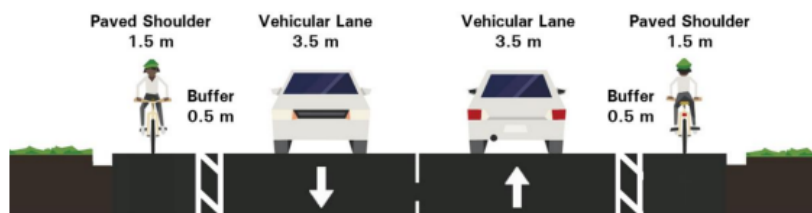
Typical and Enhanced Rural Cross Section
